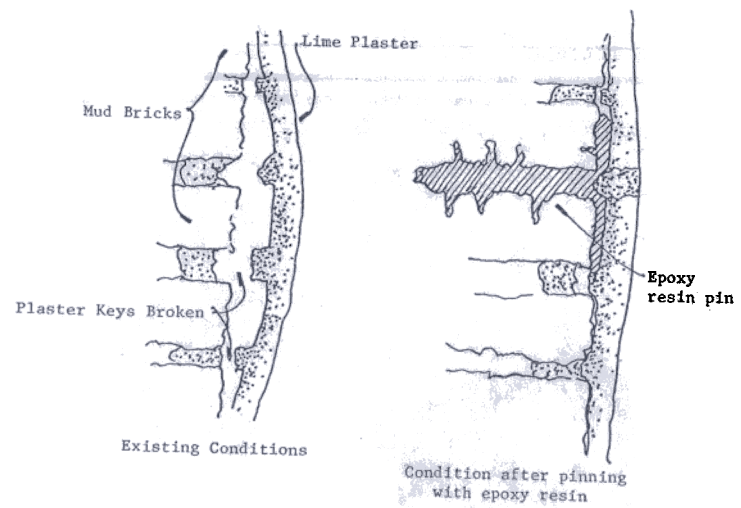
A typical use of an epoxy resin pin to reattach lime plaster to the mud brick wall.
